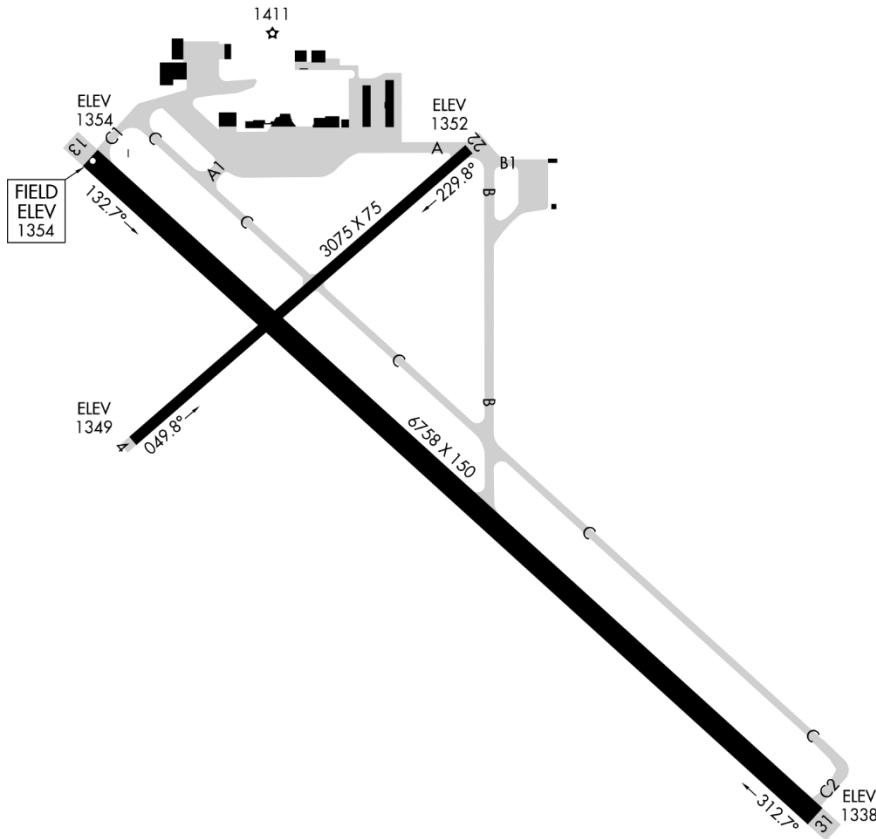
Current Airport Layout (FAA Airfield Diagram)
